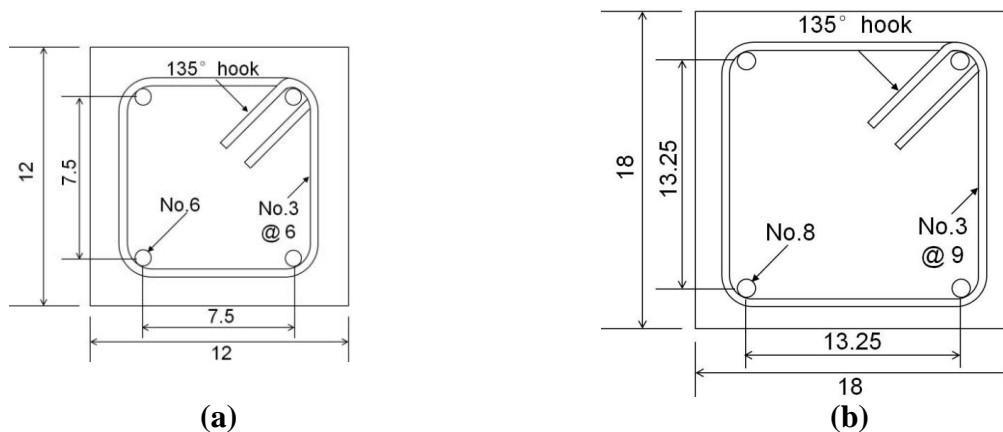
Column cross section: (a) top and 3rd floor and (b) 1st and 2nd floor (unit of dimension: in.).
